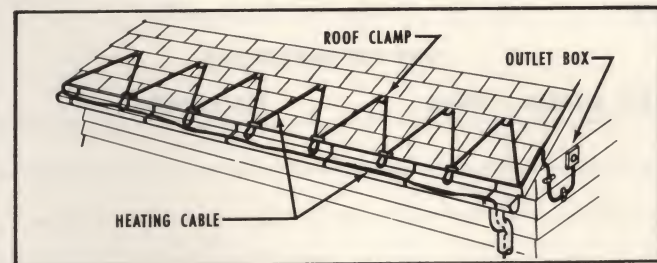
TAPE USED FOR WINTER ROOF DRAINAGE
